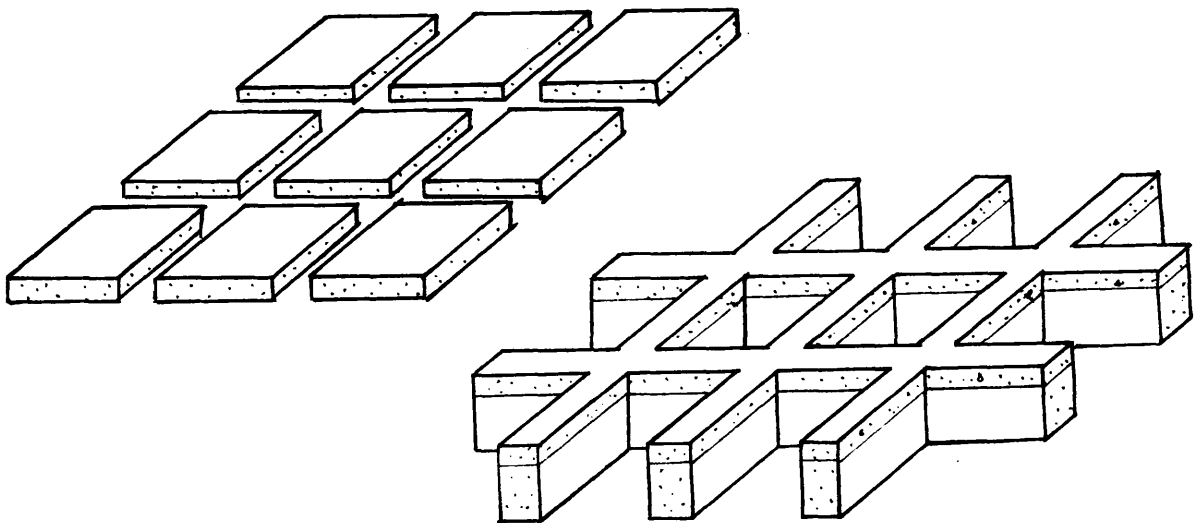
Ribs and Deck Slabs of the Waffle Slab
